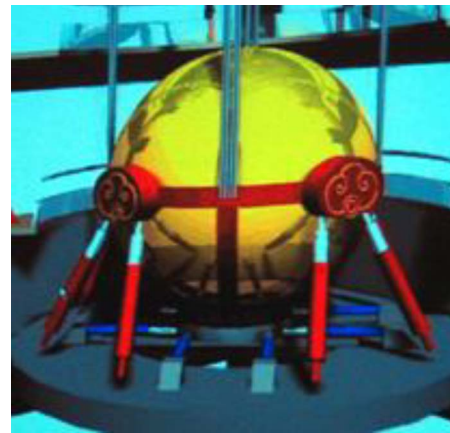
Photo of the 660-t TMD installed in Taipei 101 Tower
